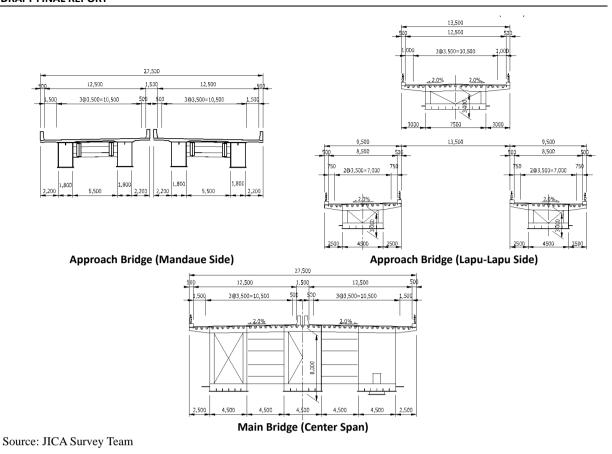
Road Width and Cross Section of 4th Cebu-Mactan Bridge
